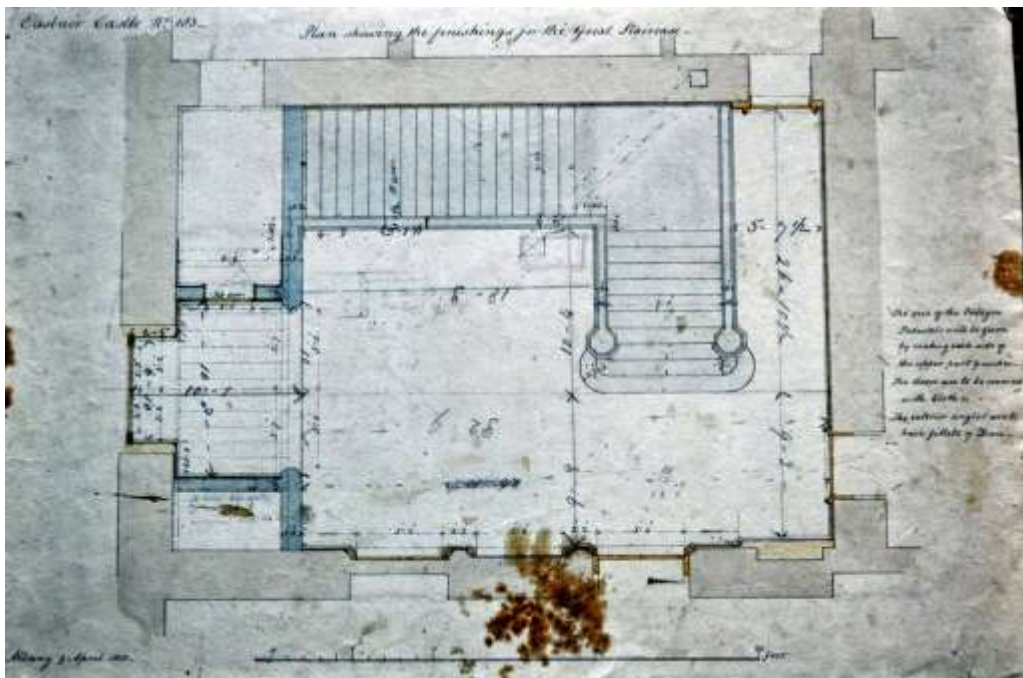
Plan 183 - ‘Plan shewing the Finishings for the Great Staircase’ – dated 3 April 1818 (Eastnor Castle)
